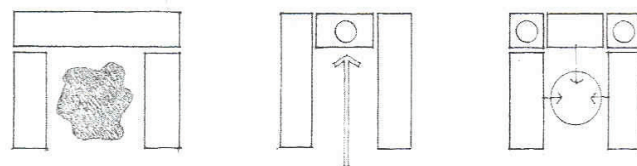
U-shaped Configurations of Building Forms (Ching, 1996)
